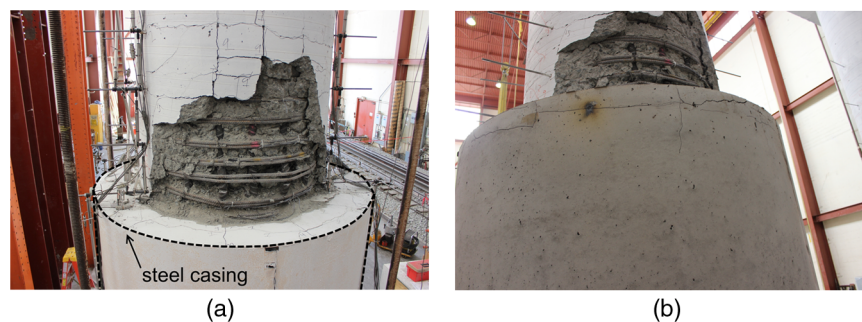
Damage in Specimen 3: (a) column base and top of the pile; (b) pile after removal of the steel casing
